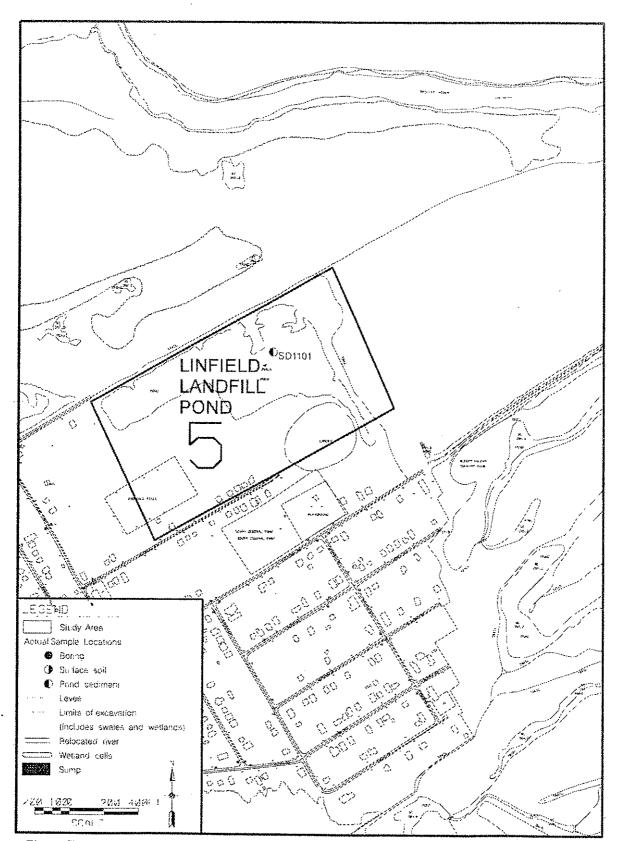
Area 5 Site Plan with Actual Sampling Location and Construction Elements.
